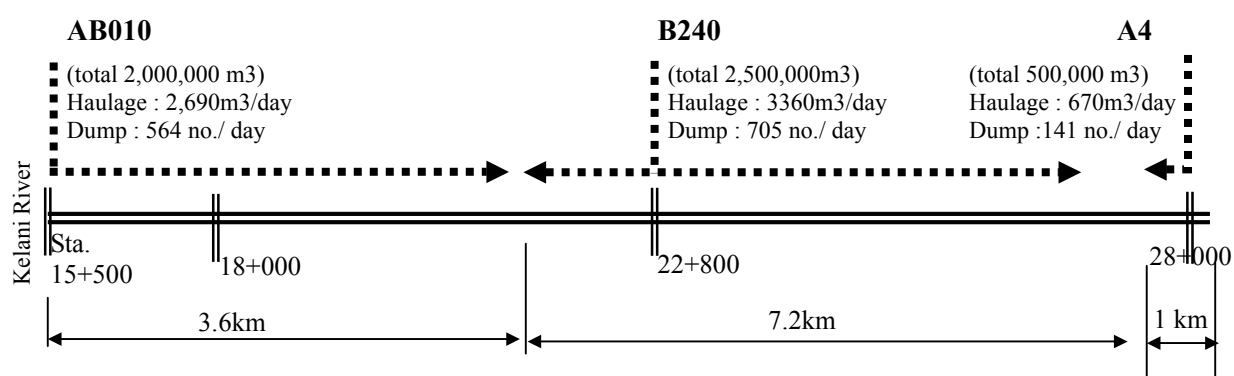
Borrow/Quarry Material Haulage Plan
